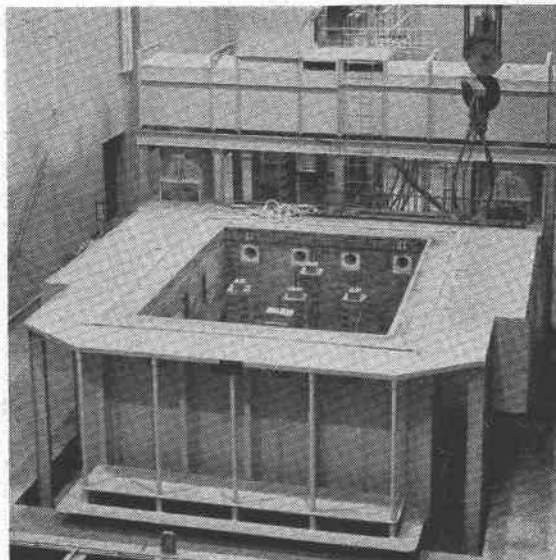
Loading frame with wall specimen in wall furnace in the furnace laboratory
